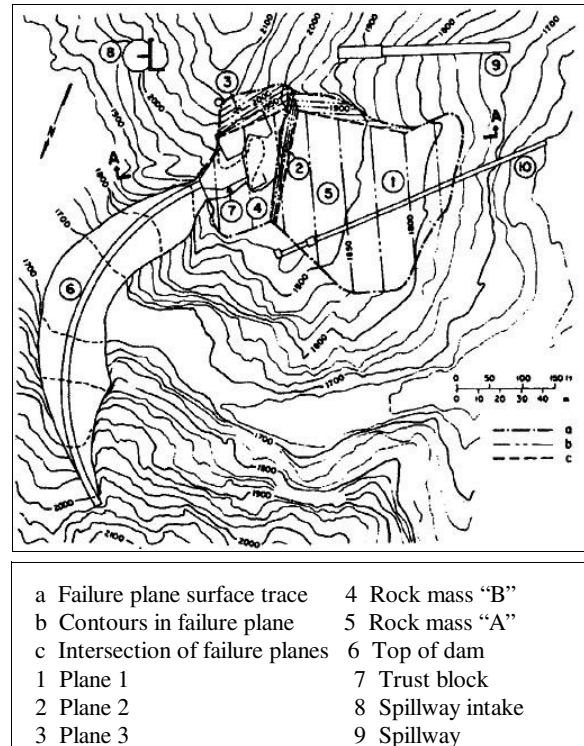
Plan view of Pacoima Dam & left abutment (County of Los Angeles [7])
